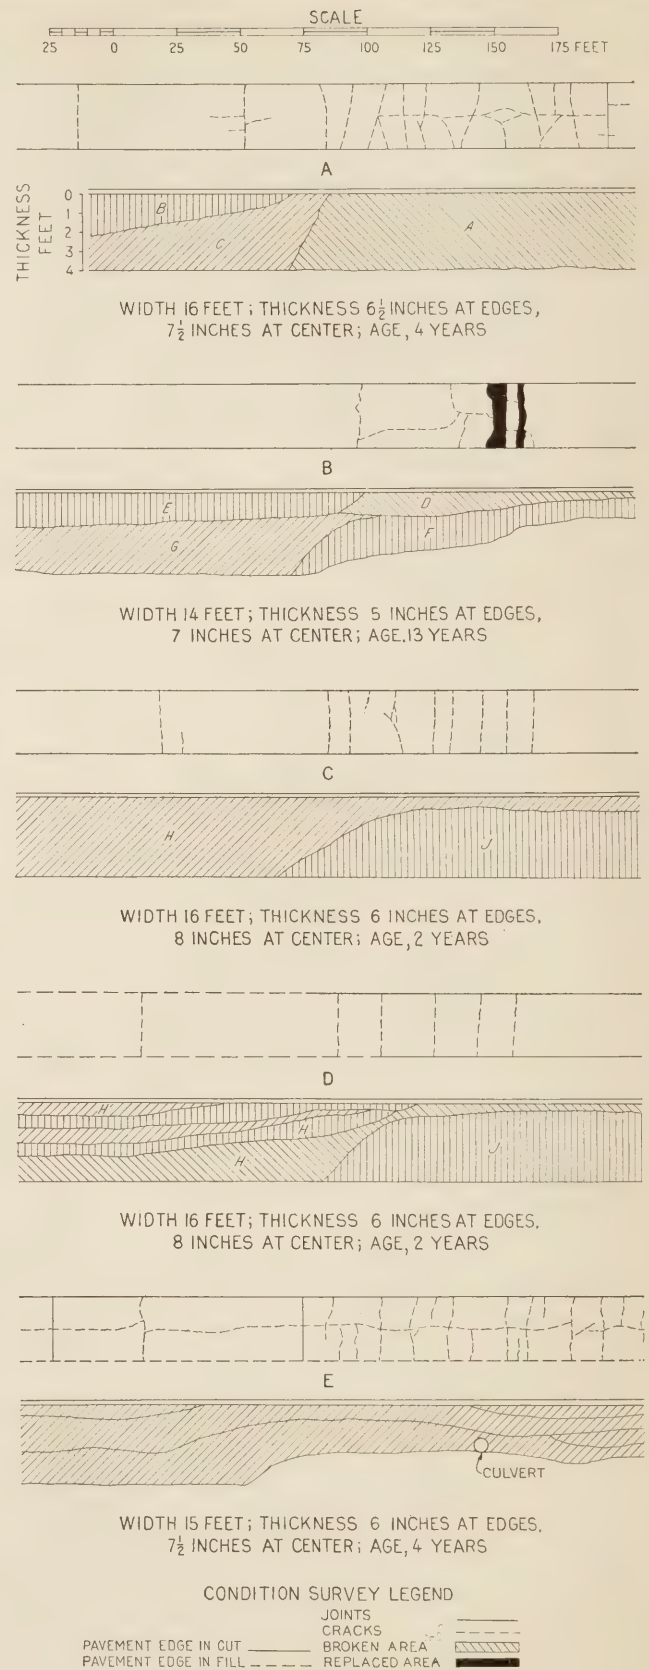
SOIL PROFILES COMPARED WITH PAVEMENT CONDITION
